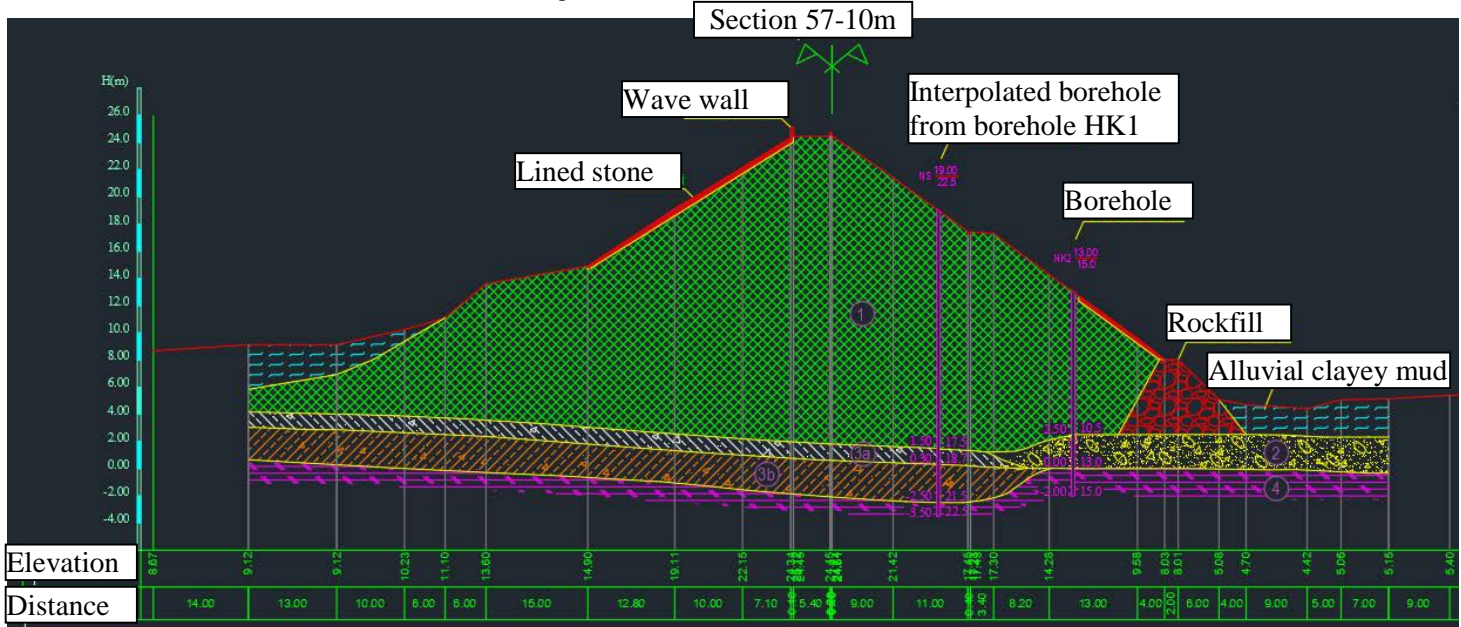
Phu Vinh dam geotechnical existing cross section No. 57.
